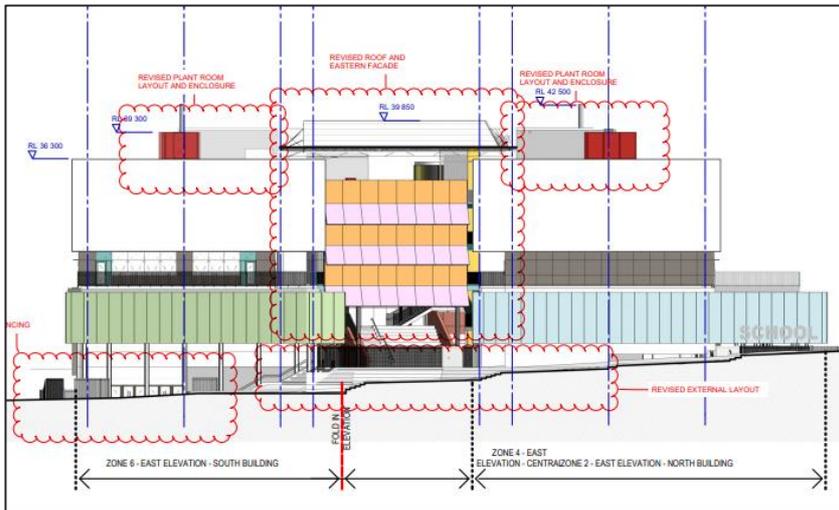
Proposed eastern elevation (Source: Applicant's Modification Application 2020)
